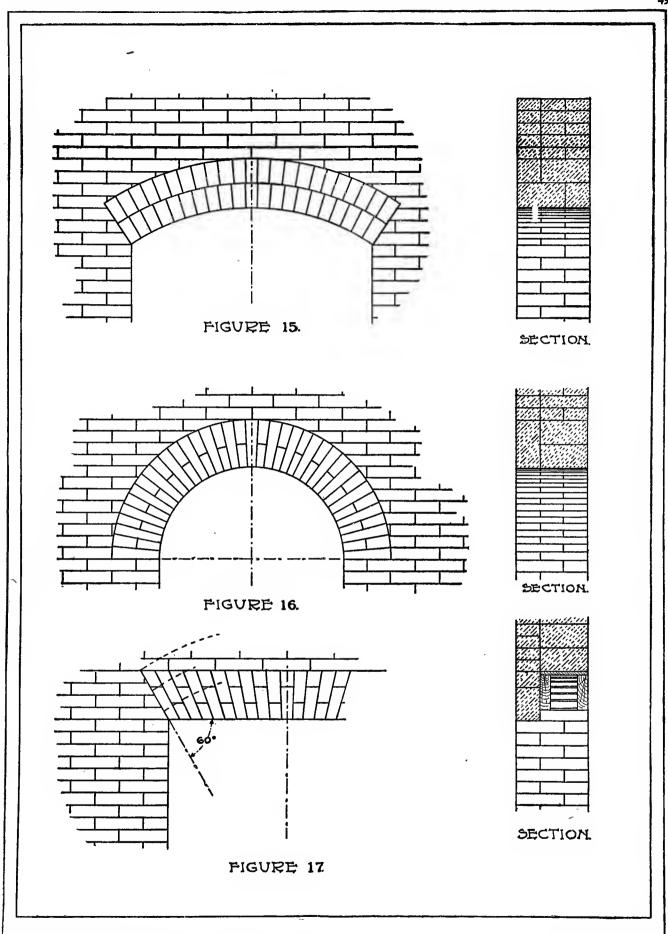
CONSTRUCTION OF BRICK ARCHES
